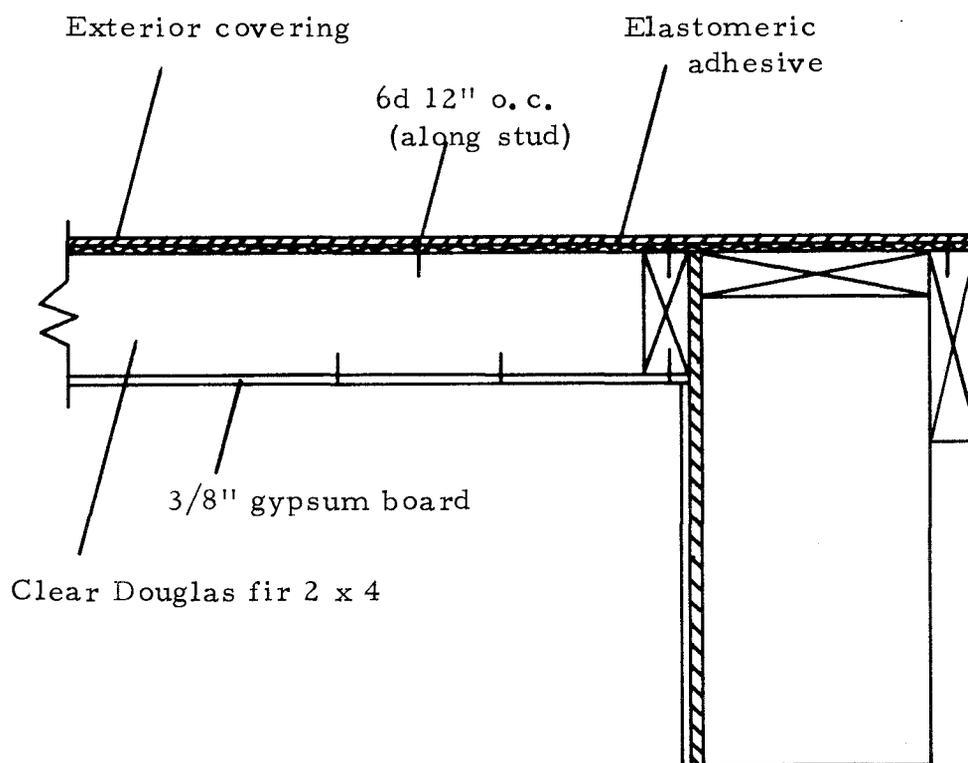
Wall construction type V where exterior covering overlaps and is nailed-glued.
